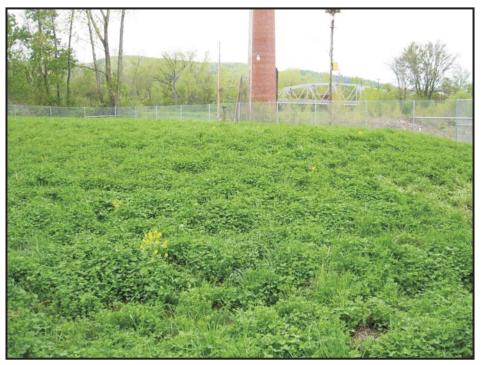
Looking northwest across landfill. Piezometer PZ-7 in background.
